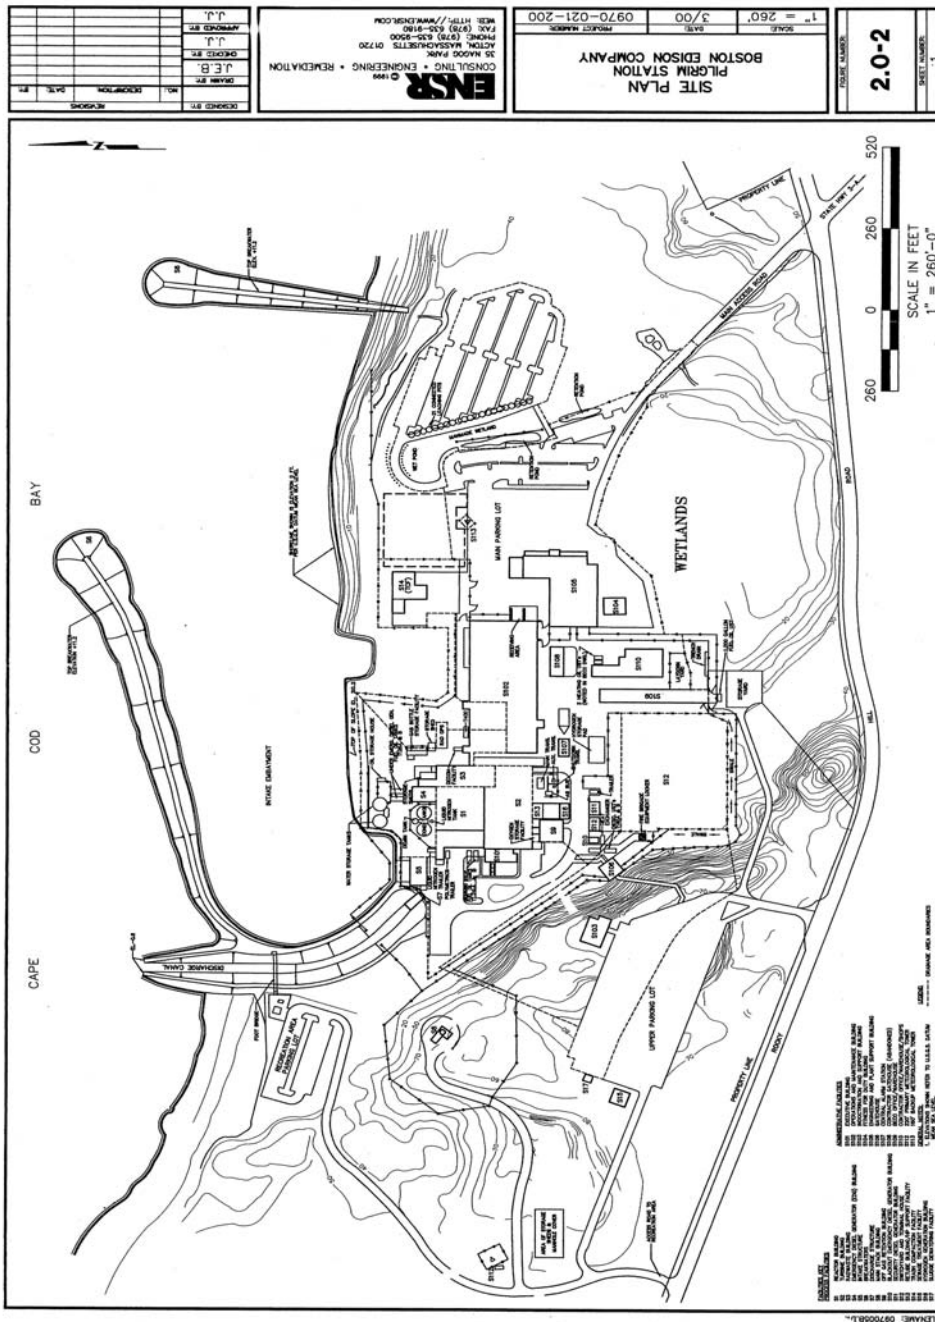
Expanded Facility Layout: Source: Entergy 2006a
